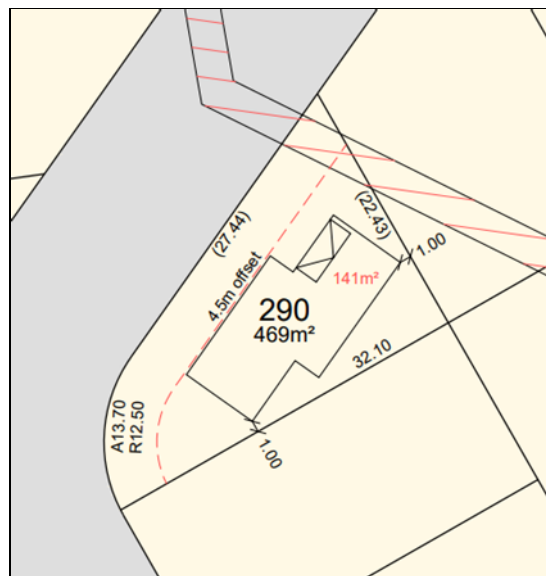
Indicative Site Layout with Dwelling (Lot 290)
